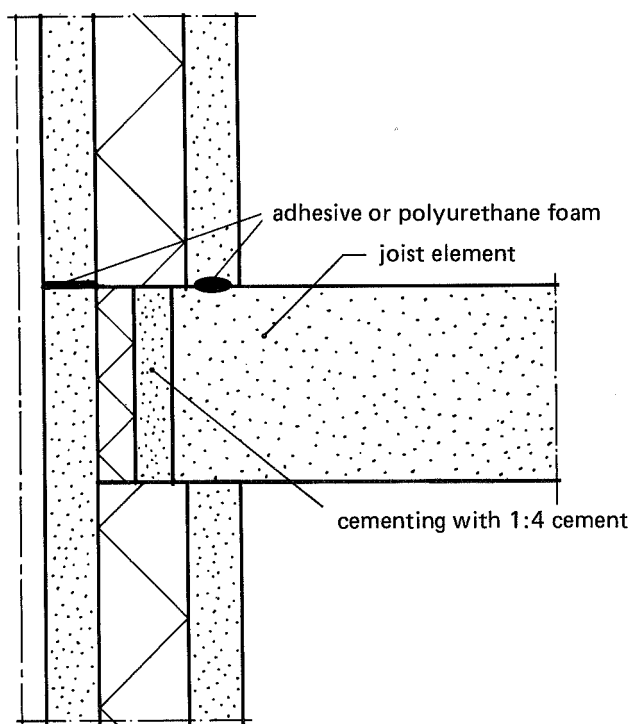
Joint between external wall of lightweight elements and intermediate joist structure of cellular concrete elements.
